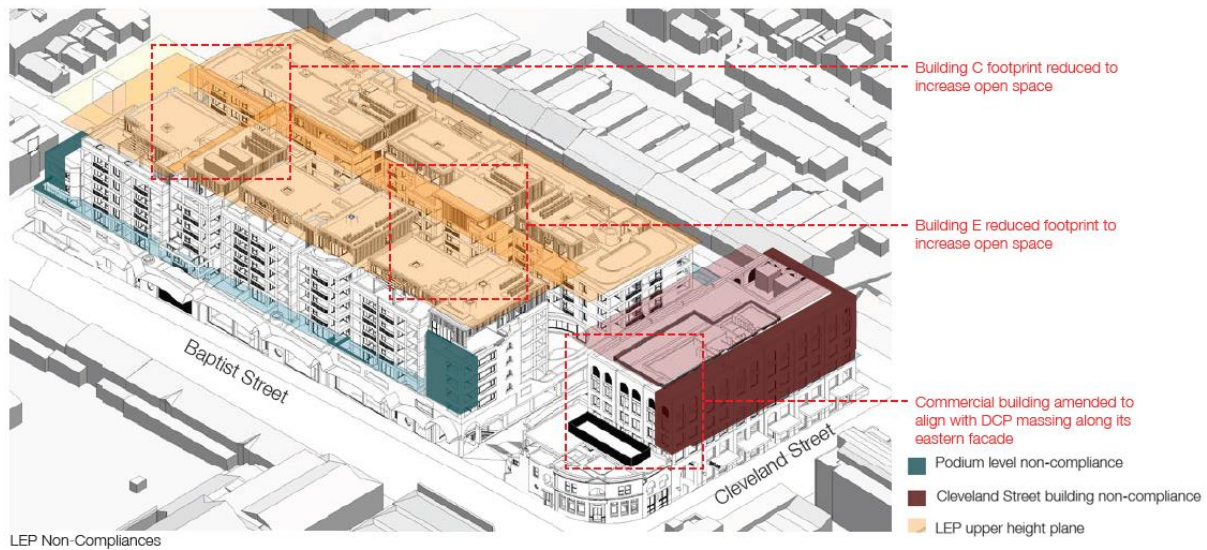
The height standards as they apply to the building envelope of the site - Cleveland Street / Baptist Street view.
